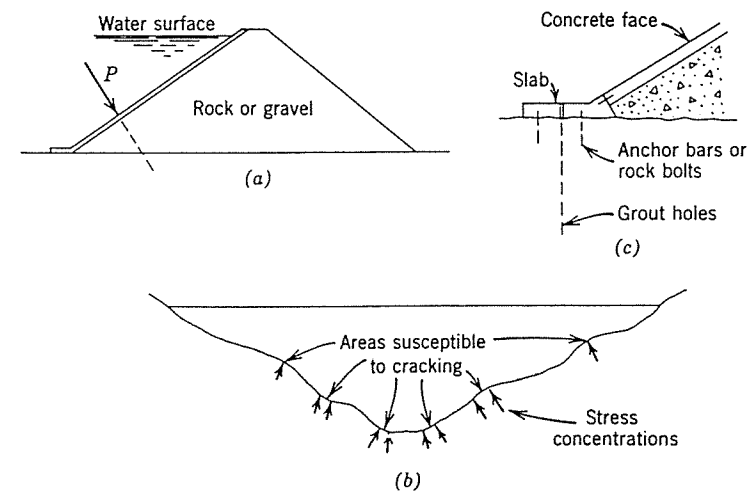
Dam with thin impervious membrane. (a) Cross section. (b) Profile. (c) Toe detail.
